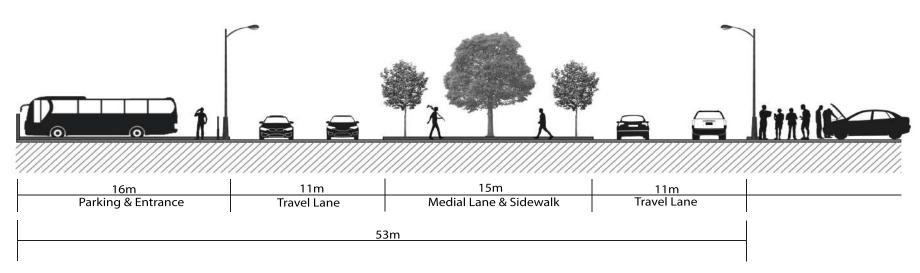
Ibn Babawayh Street, Northern side of Ibn Babawayh Street provides a proper sidewalk and connectivity Section B-B, by author
